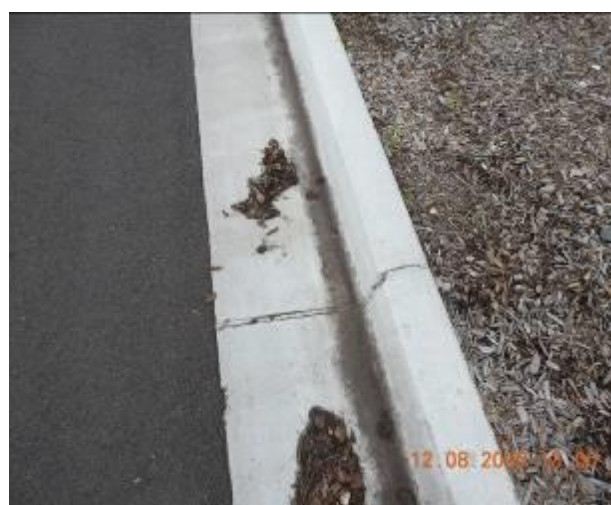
Crack propagation and loss of material through kerb and gutter
